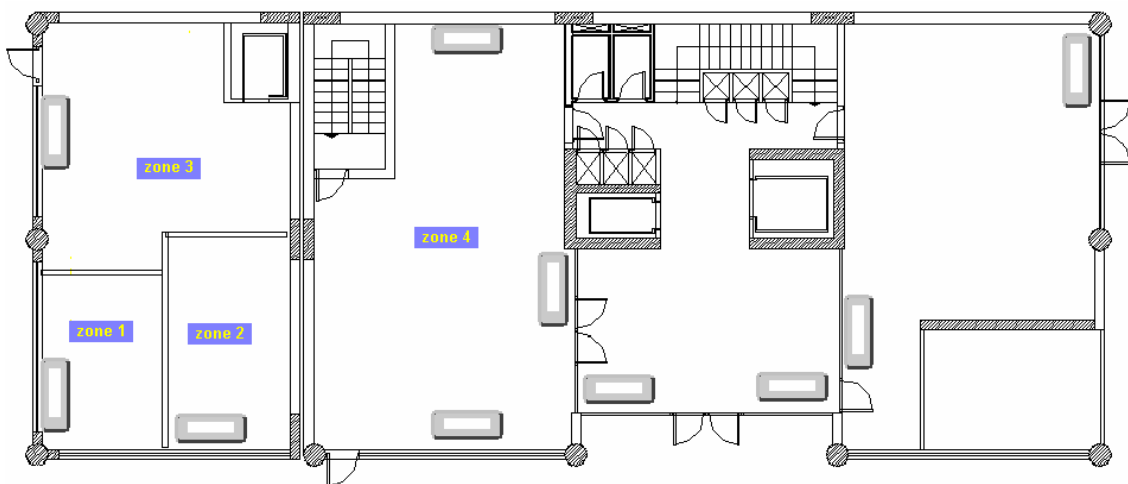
Ground Floor and thermal zones plan of BYTE.
